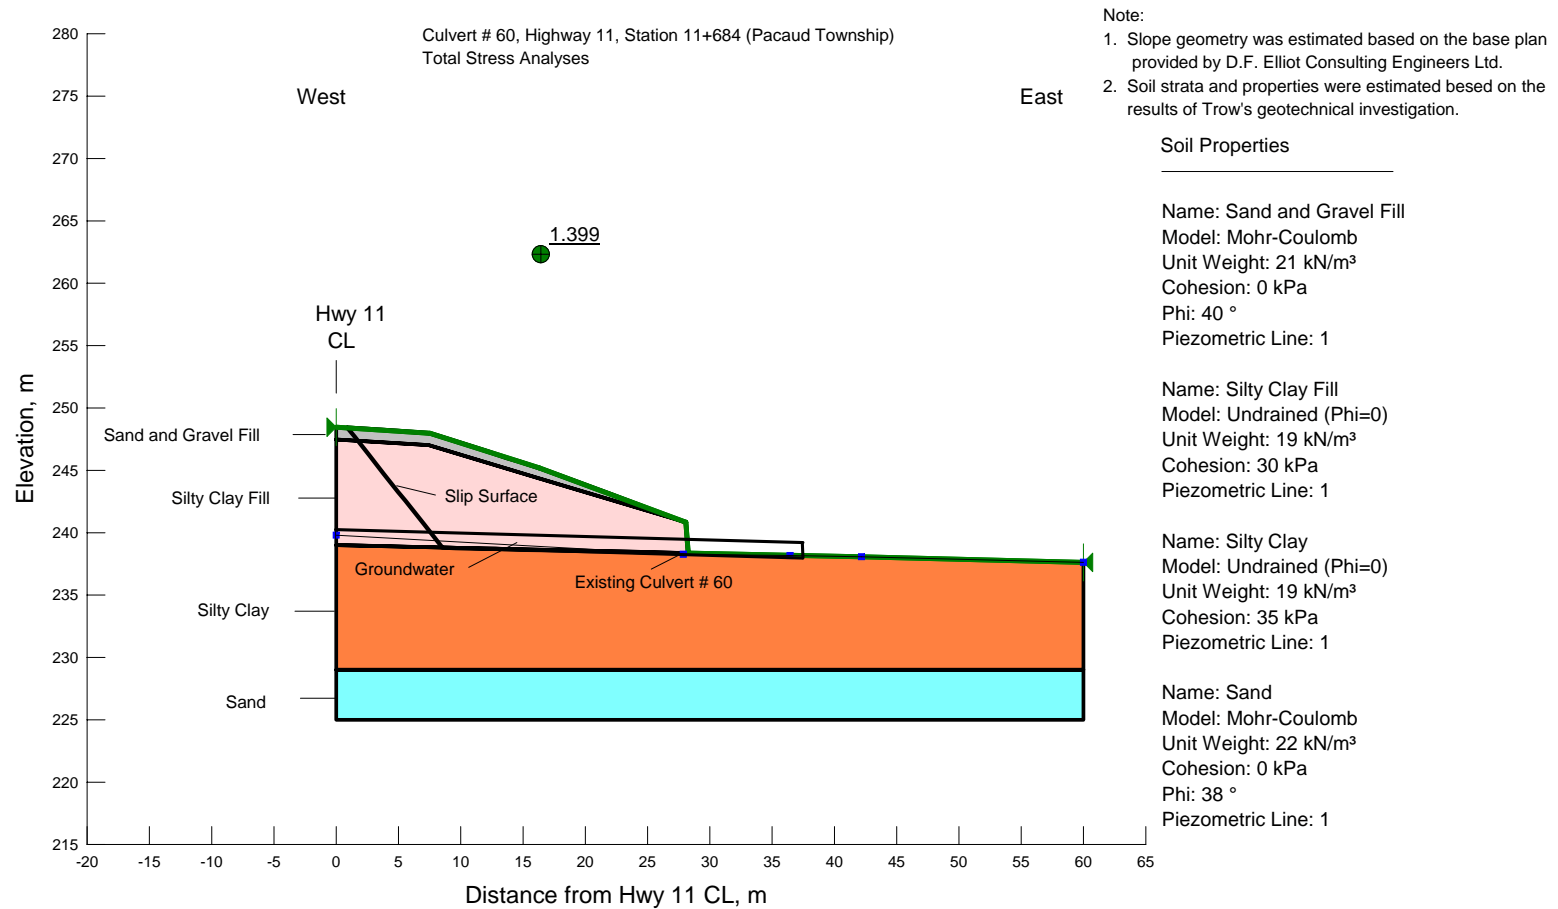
(b). REMEDIATION; Excavation for the failed culvert extension replacement using the support system and slope flattening. Slope stability analyses for HWY 11 embankment slope after excavation of trench assuming total stress parameters; silty clay fill $C_u=30$ kPa and silty clay $C_u=35$ kPa, and non-circular slip surface.
